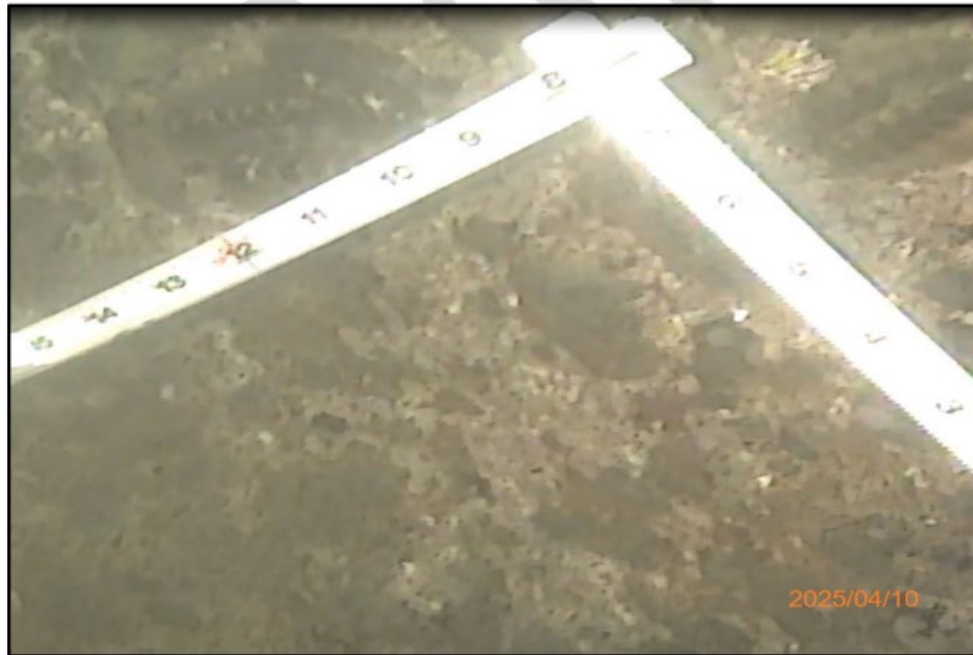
North Tower Pier, West Face, Abrasion, 3-in deep
